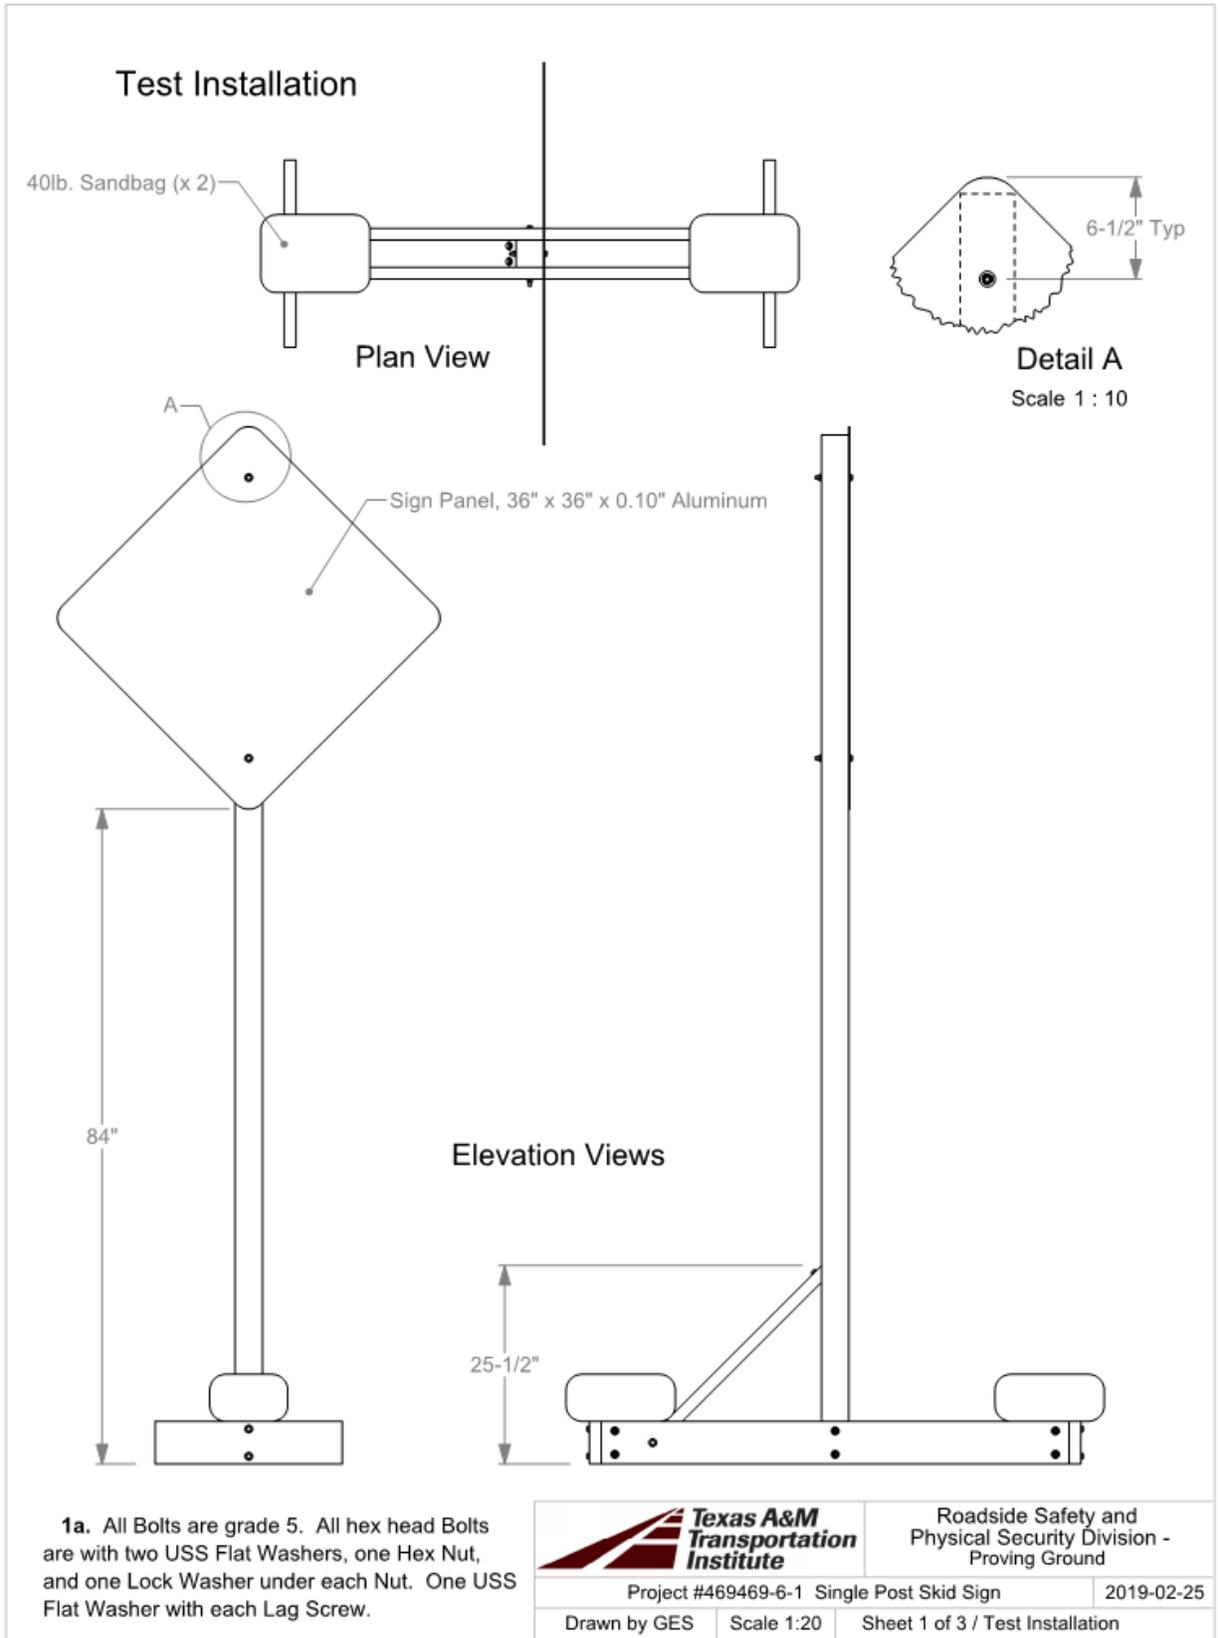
Overall Details of the Single Wood Post Skid-Mounted Sign.
